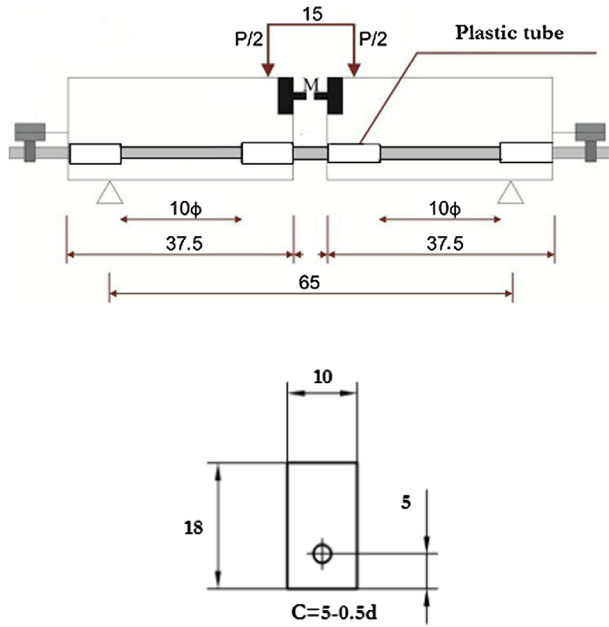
Beam test set-up (Dimensions in cm) – EN 10080.
